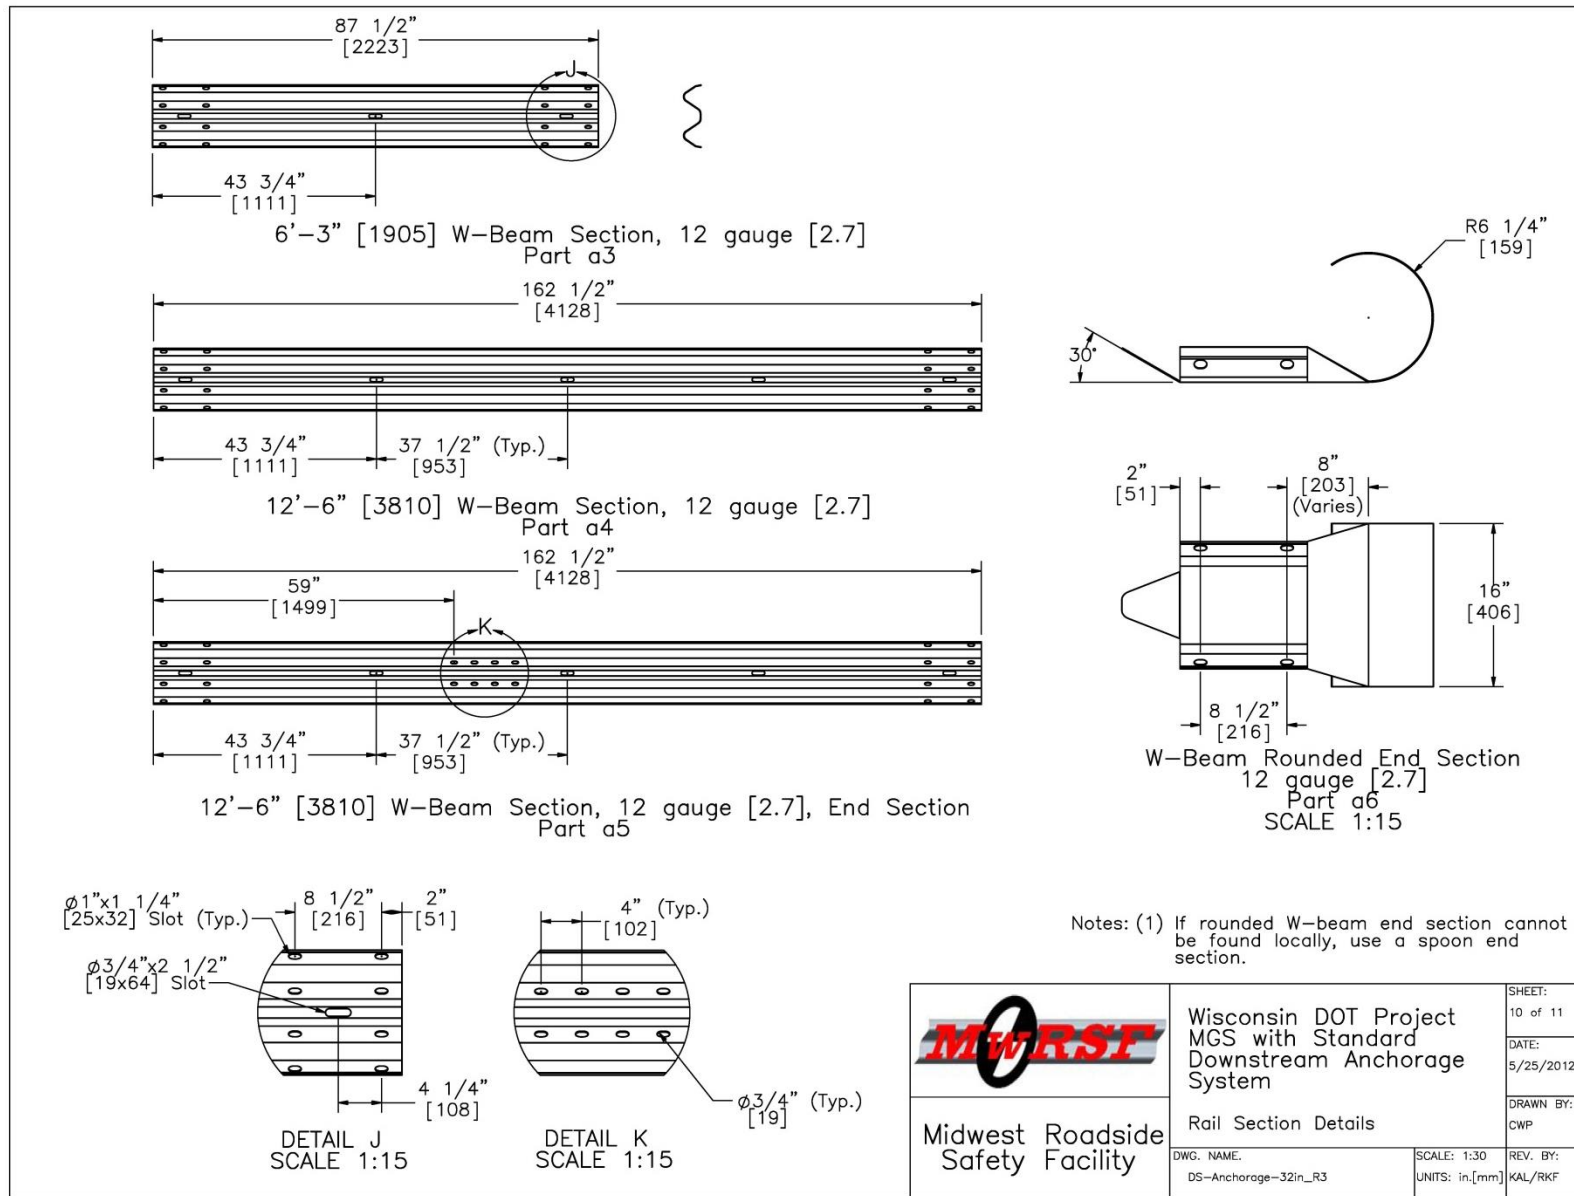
W-Beam Guardrail Details, Test No. WIDA-2
